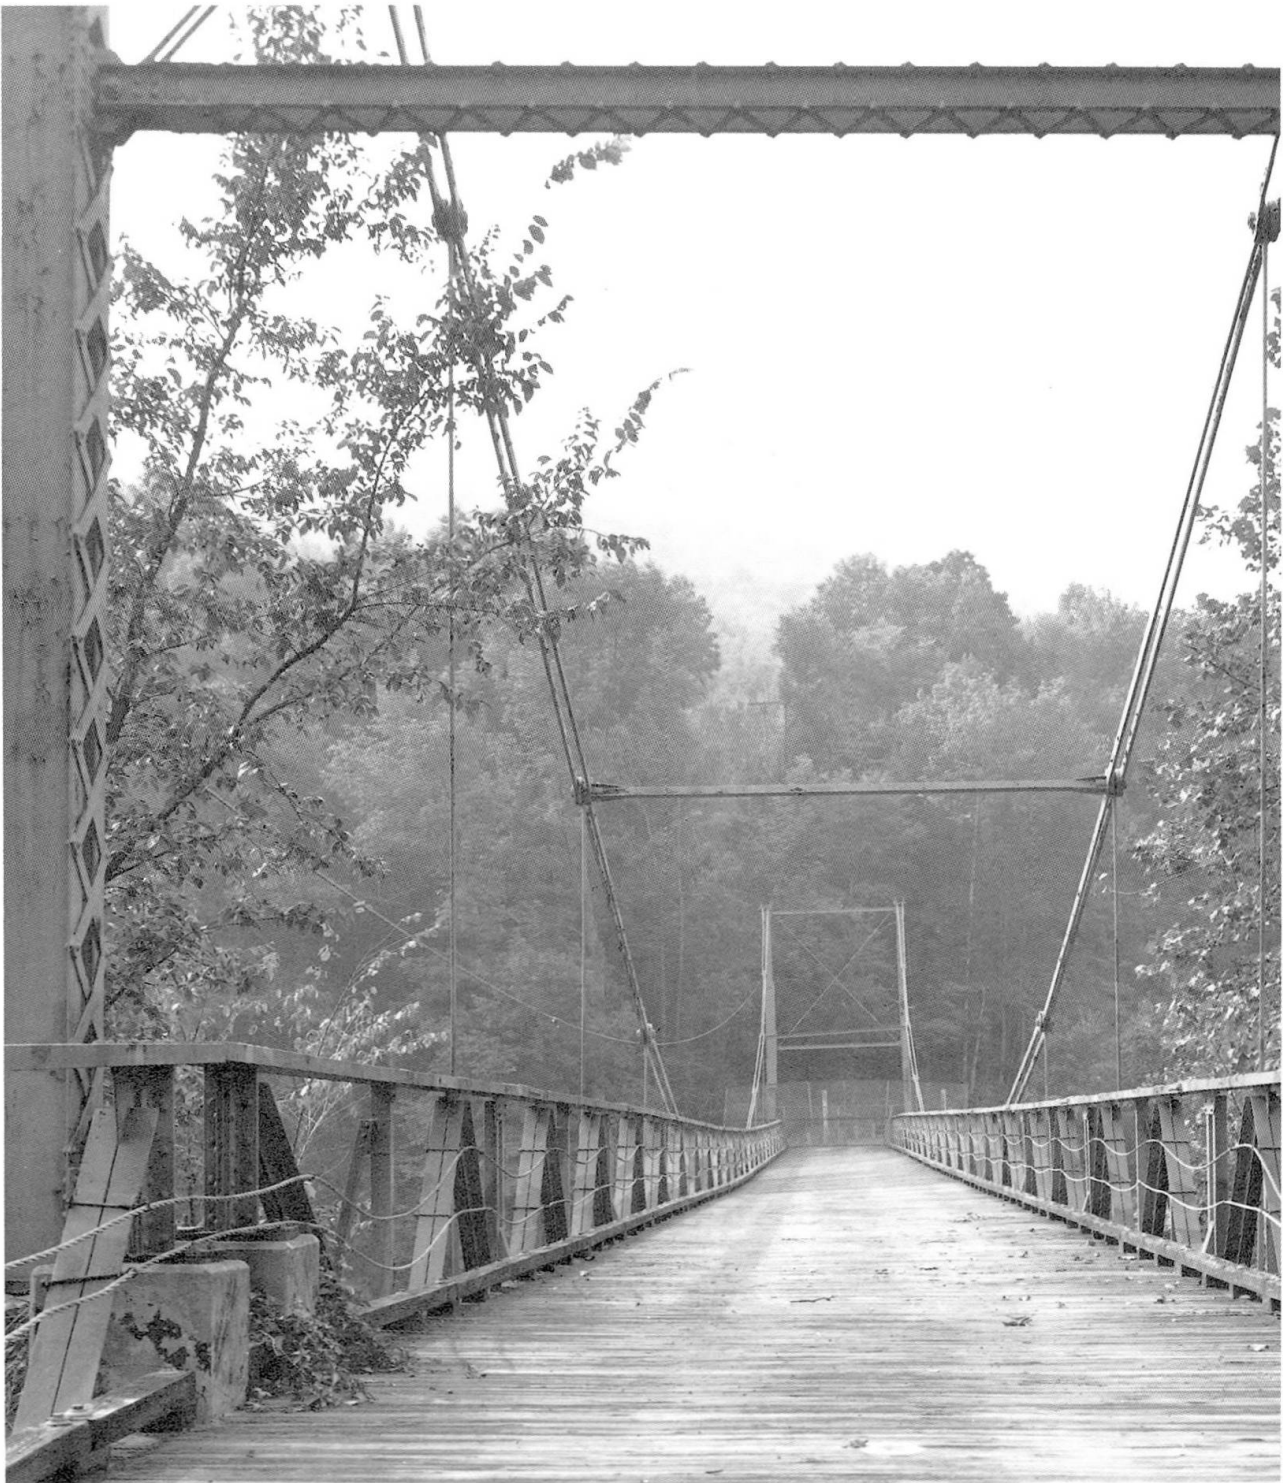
Ca. 1902 eyebar suspension bridge at Lordville, NY that failed and was recorded and demolished in 1986-1987.
